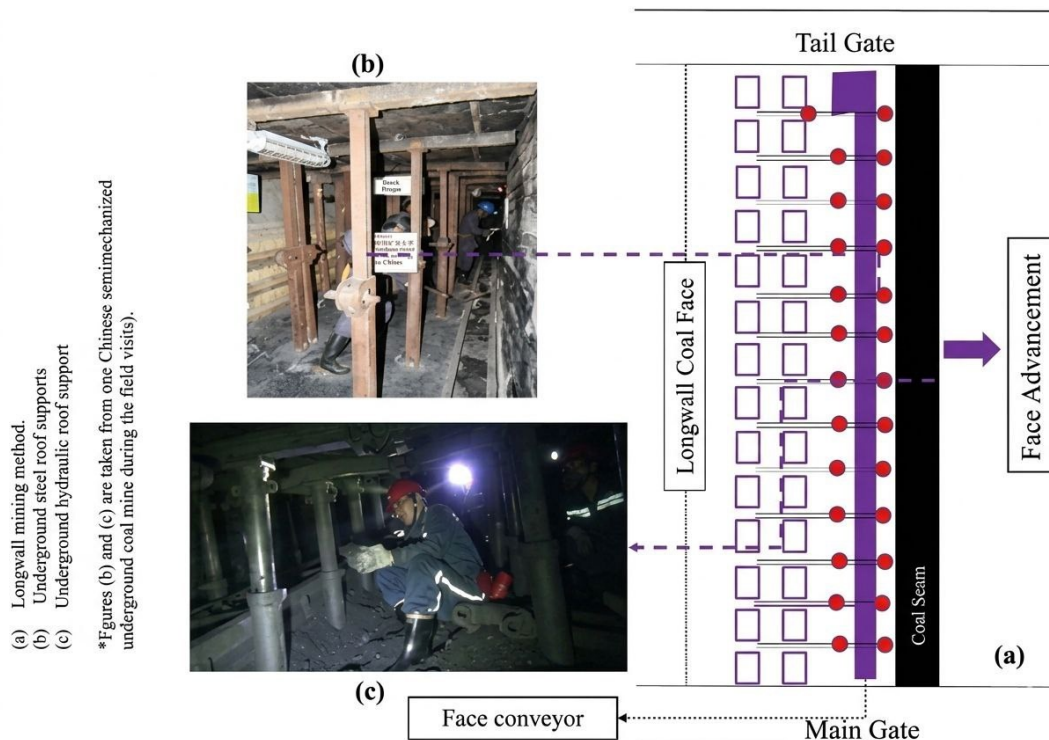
Suggested arrangement of semi-mechanised longwall mining method in coal mines in Pakistan.
